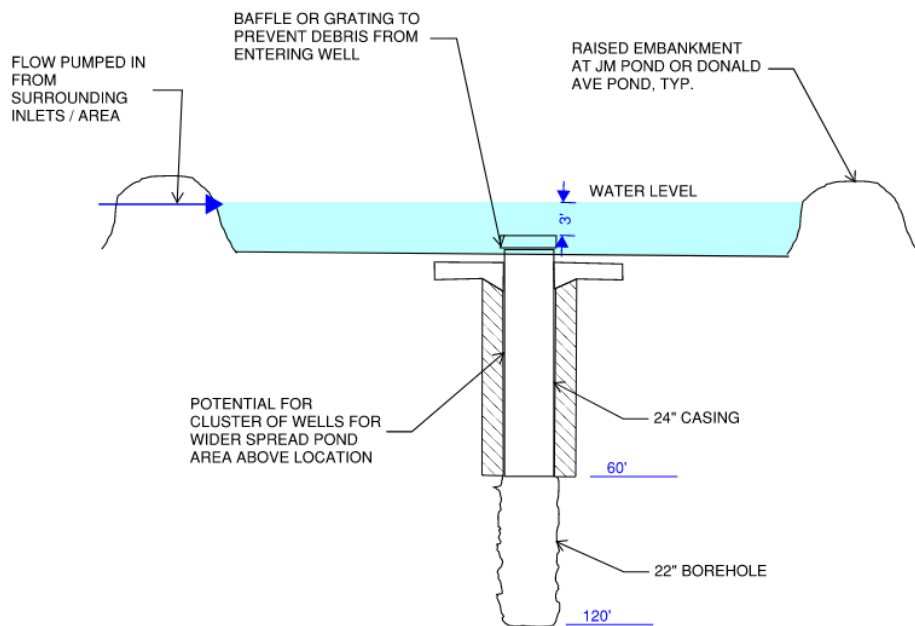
Conceptual Sketch of Modified Gravity Well Concept Pond Location
